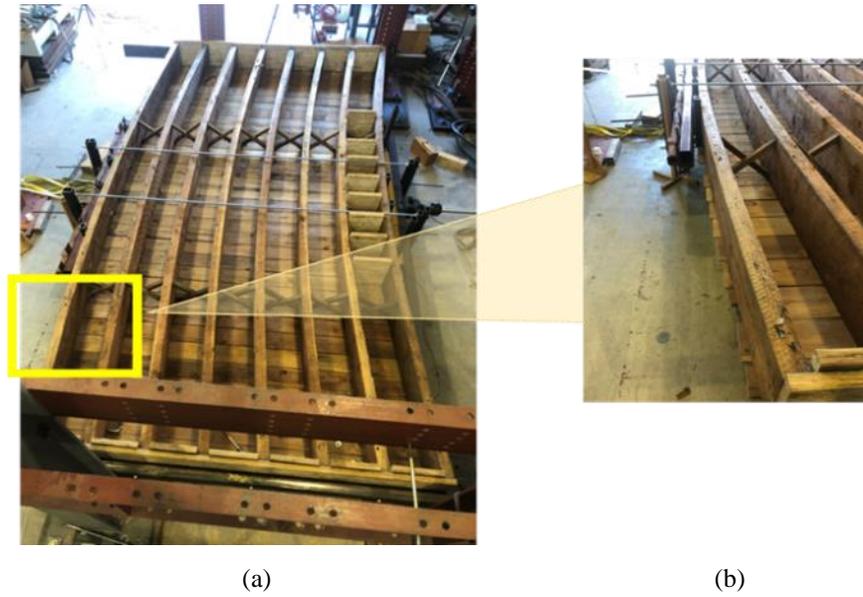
Deformation of the roof deck specimen and the shiplap sheathing on the joists: (a) General view, (b) Close up.
